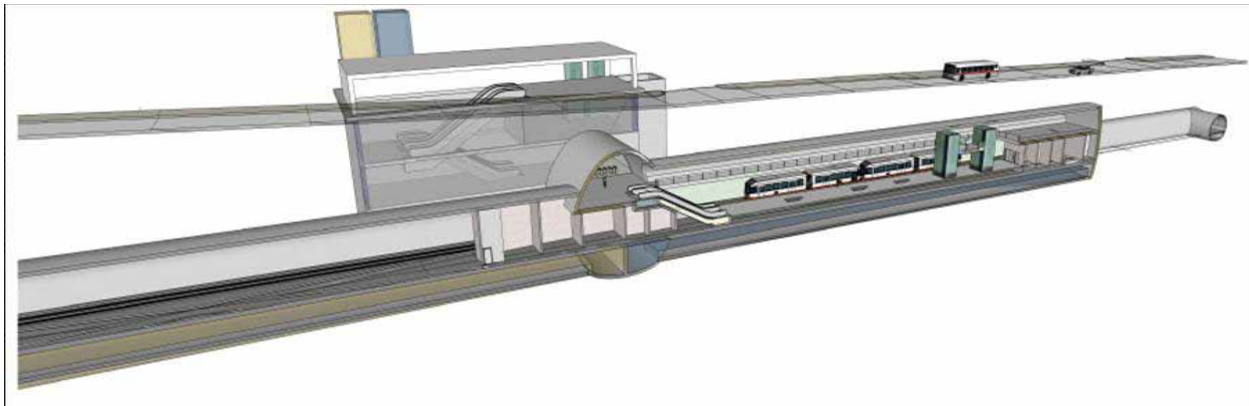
Proposed Fourth Street Alignment for Central Subway
